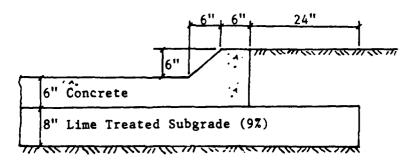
Cross-sections of Sites No. 1, 2, and 3 pavement and subgrade.
